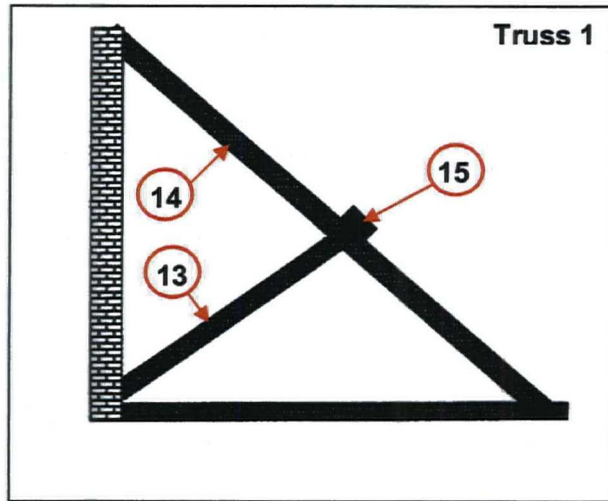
Roof trusses of the connecting range showing sample positions (trusses viewed from the south looking north)
